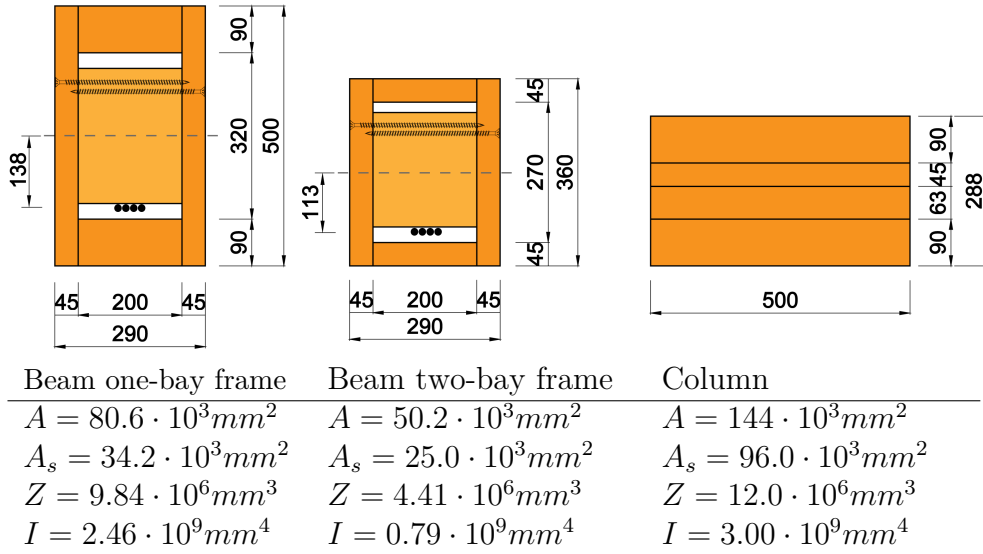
Cross-sections and properties of beams and columns for one-bay and two-bay frame tests
